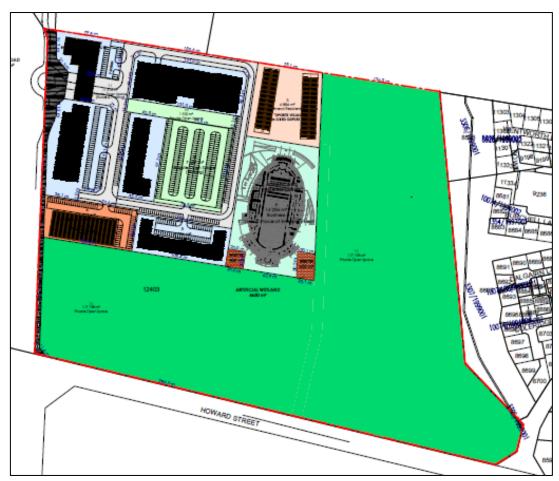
EXTRACT OF SITE DEVELOPMENT PLAN
